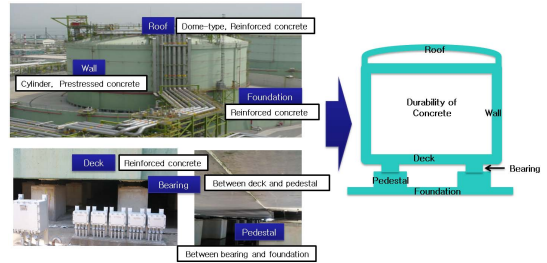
Above-ground of LNG storage tank(Elevated concrete base)
